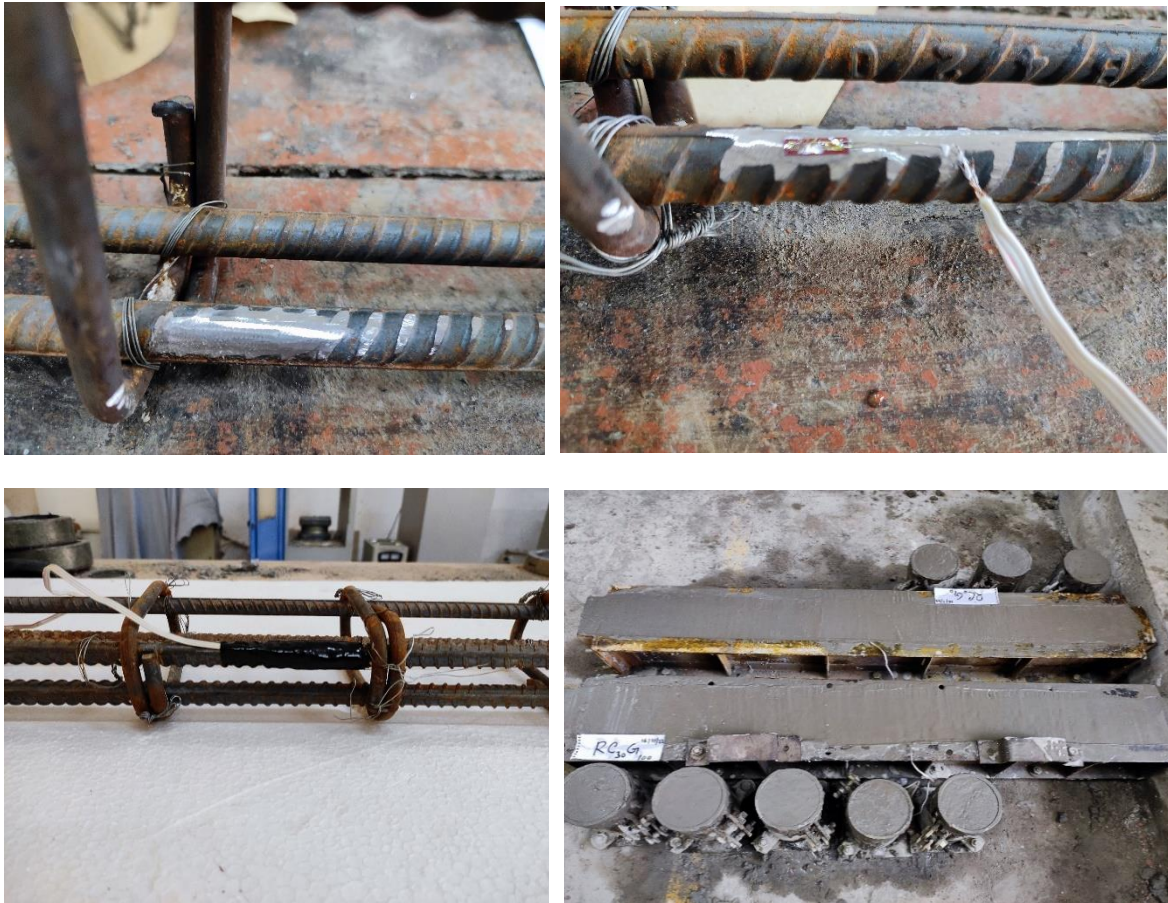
Strain gauge installation process of reinforced concrete (RC) beam
